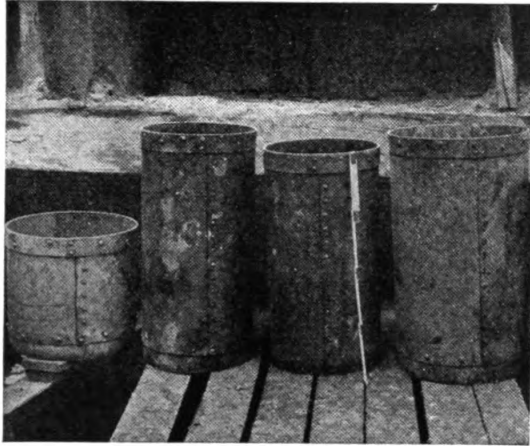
Steel Tube Forms for Concrete Piles Driven Under Low Head-Room
